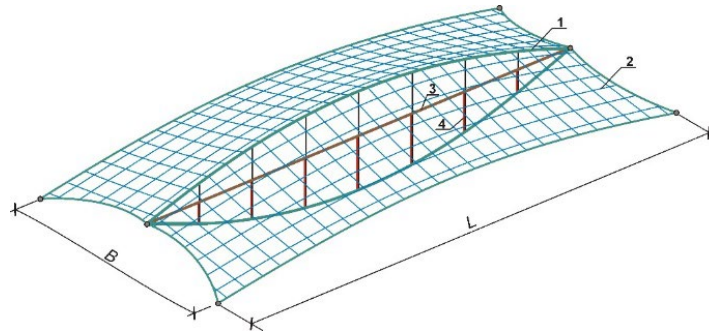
Structural model of the roof's fragment: 1 – cable truss; 2 – flexible membrane; 3 – stiffening girder; 4 – ties for simulating the loose connection (design clearance).
